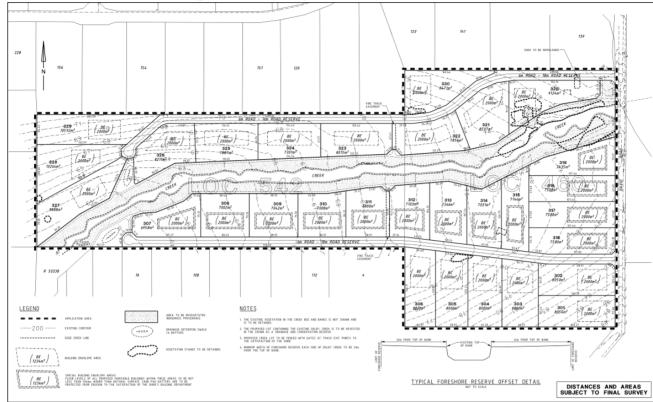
I - Dolby Creek Subdivision Guide Plan
